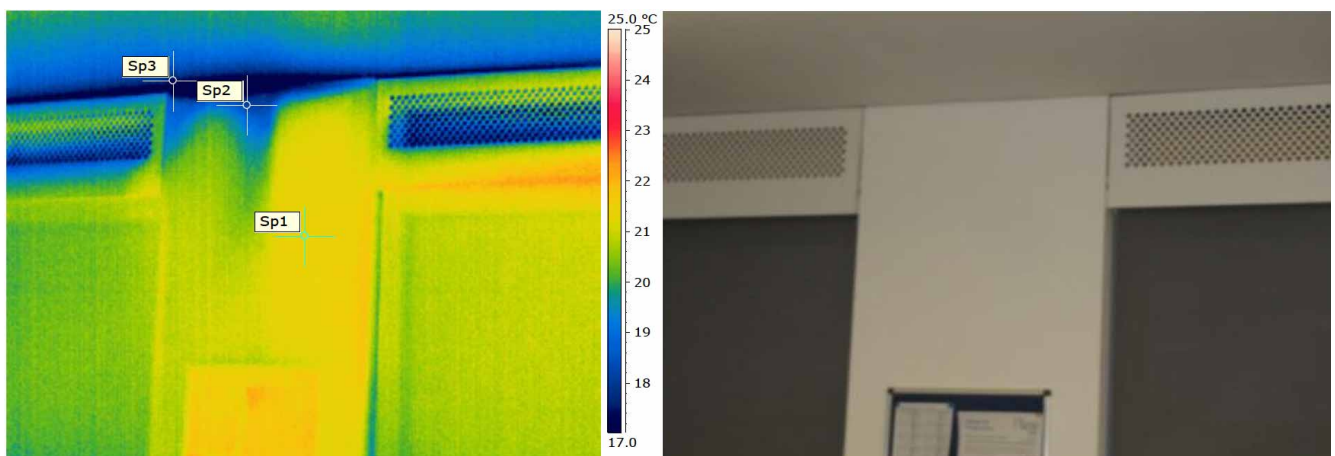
Potential thermal bypass behind plasterboard - windows in open plan office
